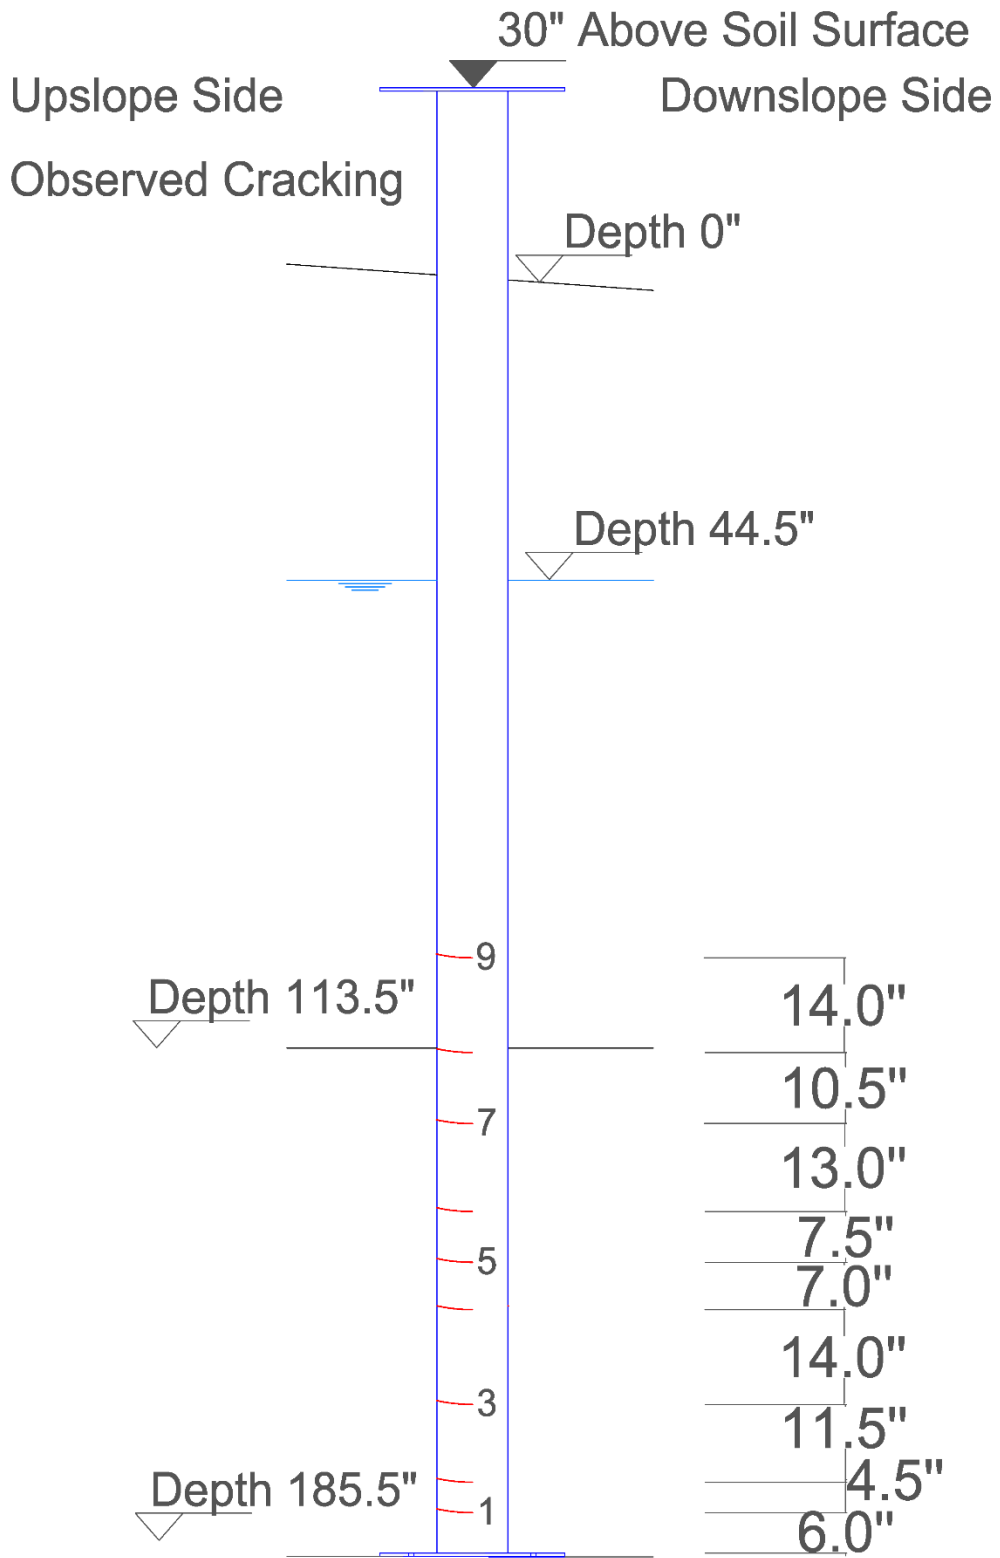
Observed cracking layout on the pile after excavation
